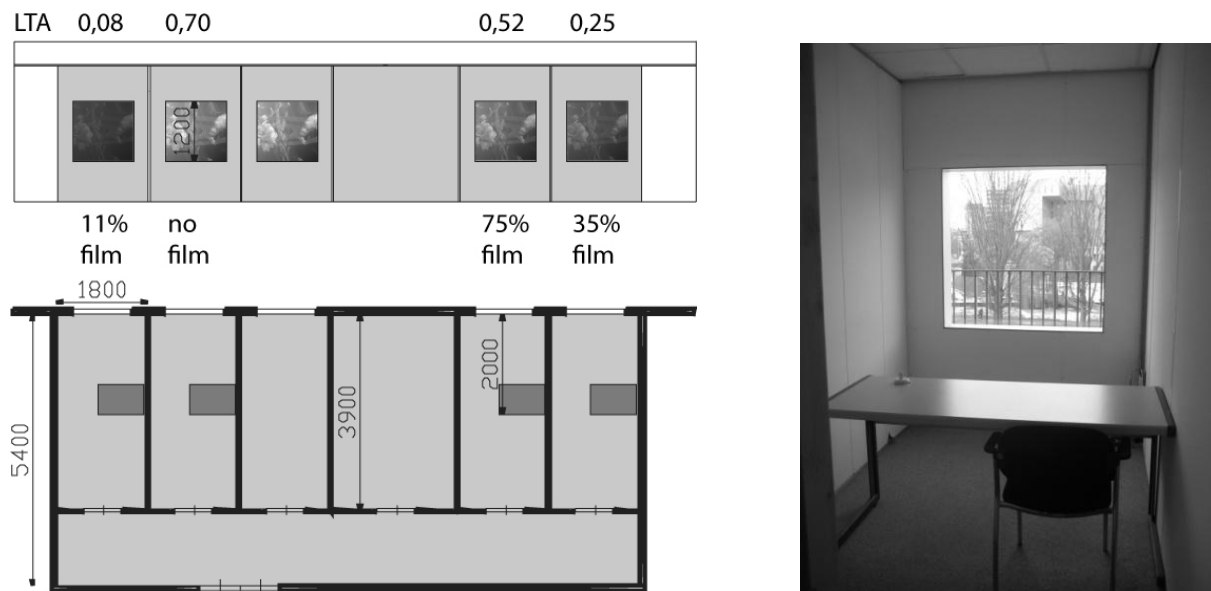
Floor plan and facade laboratory test spaces (left); photo of test room (right)
